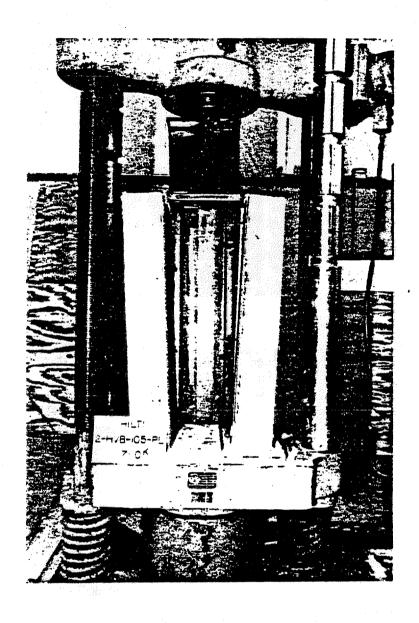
Photograph Showing Failure of Nail Connection, Failure Modes S2, S3
